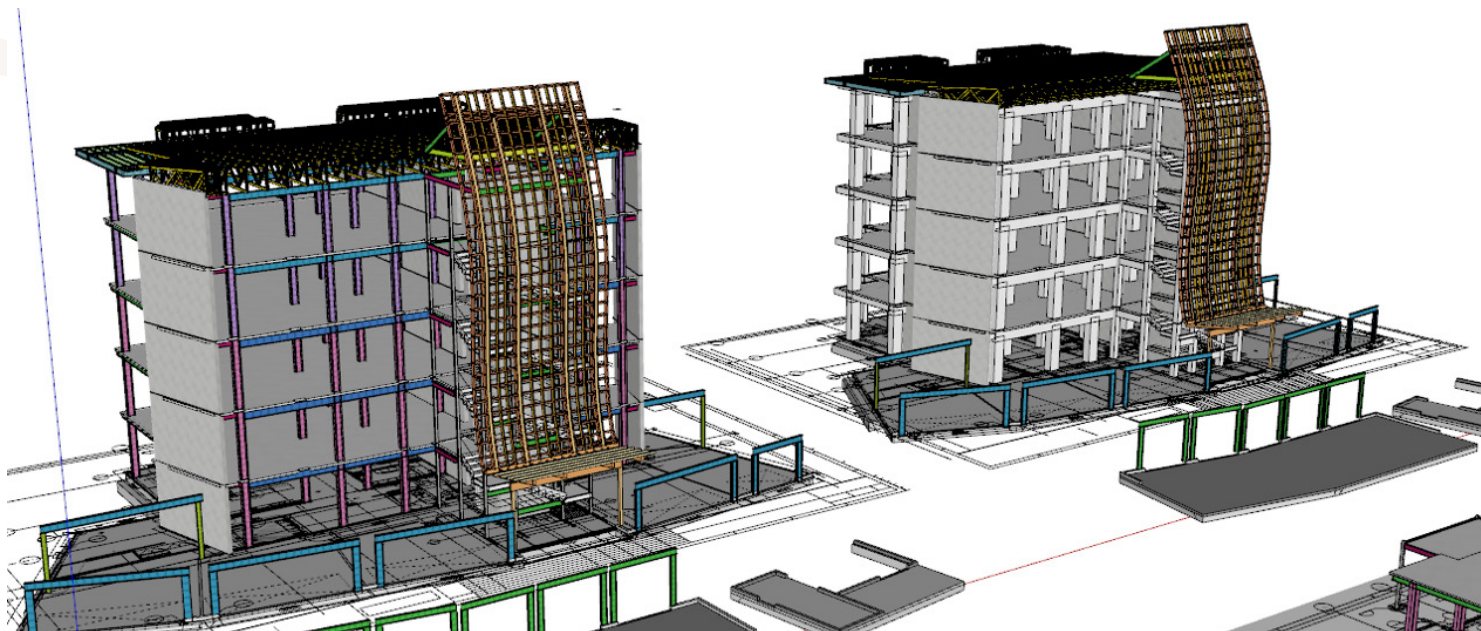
Left: Steel frame & concrete floors Right: Full In-Situ Concrete
